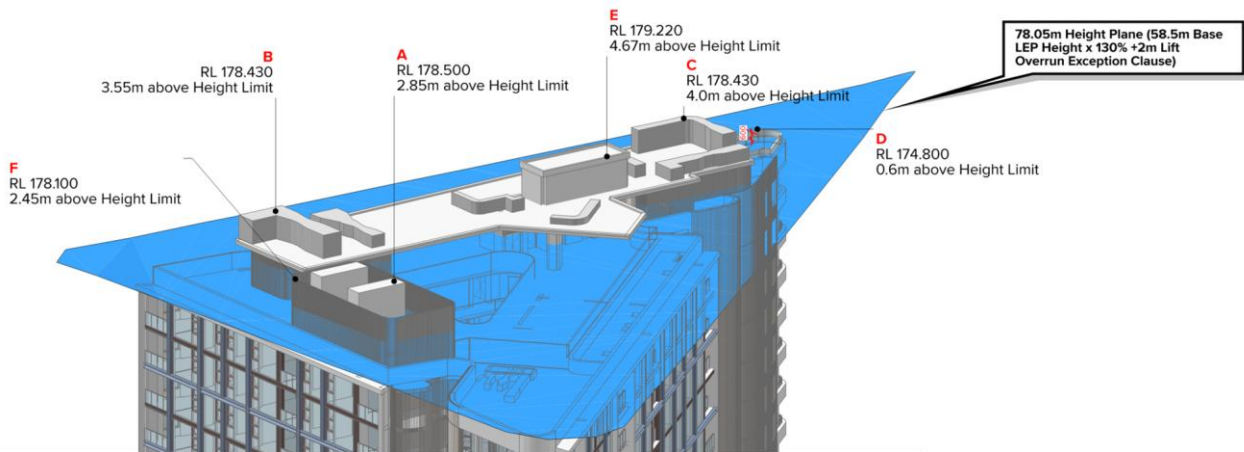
Extract of the Proposed Height Plane Diagram (Source: Turner)
